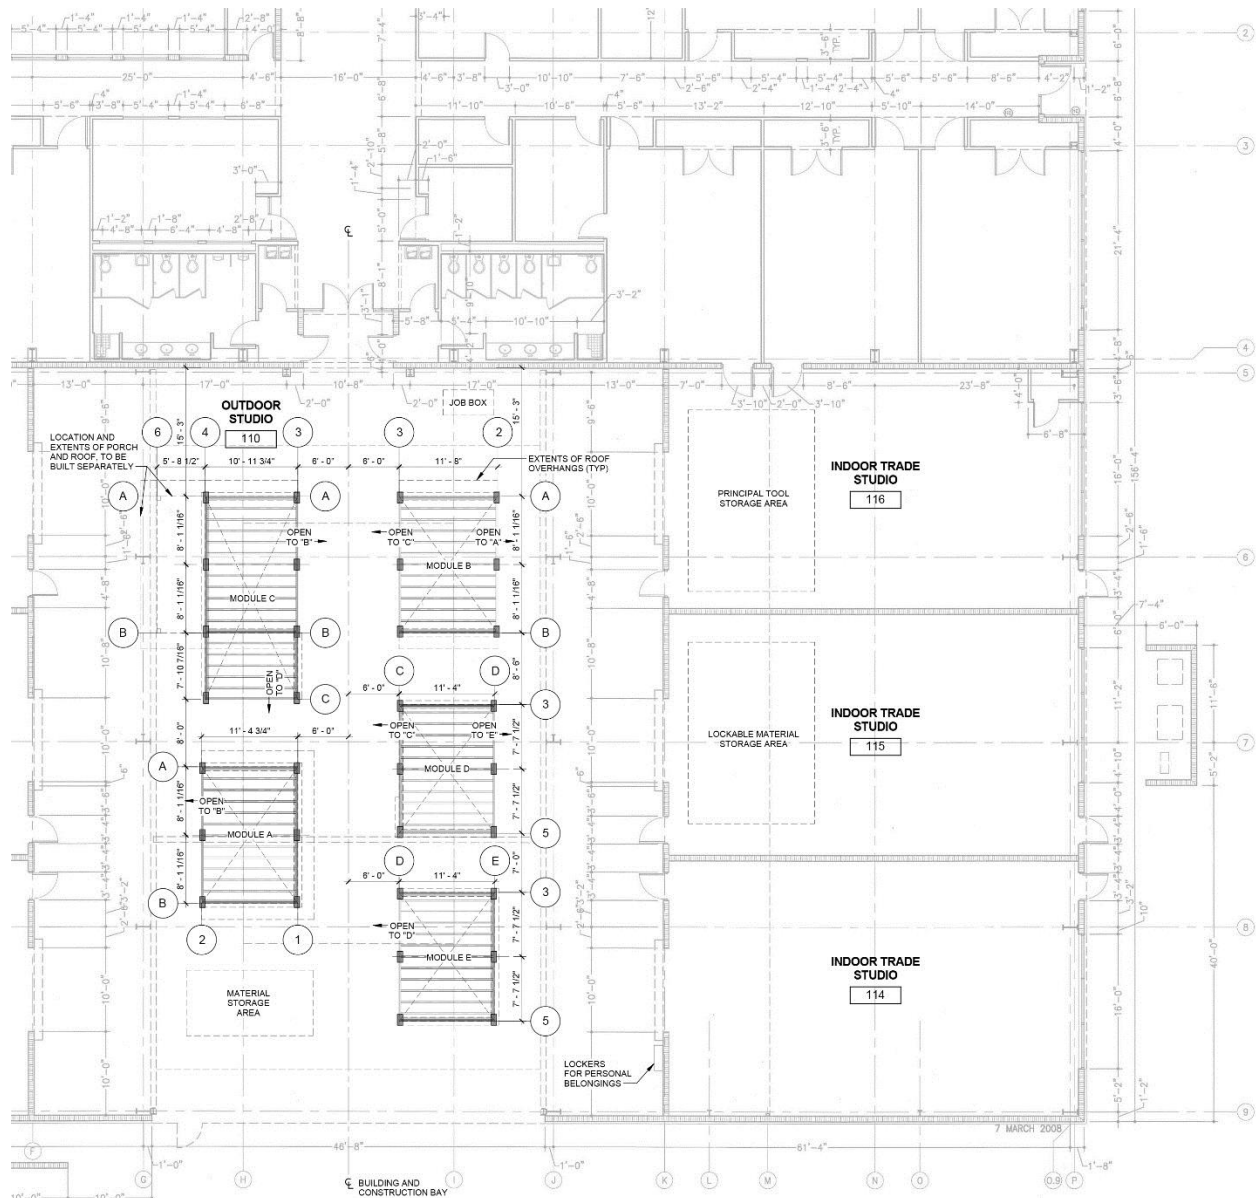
Partial floor plan of the Charles R. Perry Construction Institute at Santa Fe College, showing arrangement of modules in the construction studio. Adjacent trade studios were used for tool and material storage.
